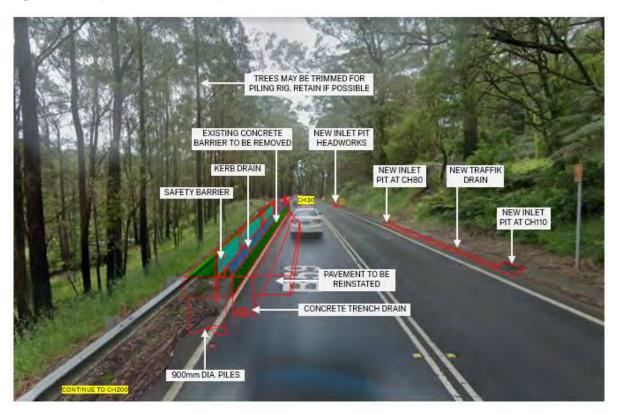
Location of construction footprint and ground disturbing works at slope 96403
